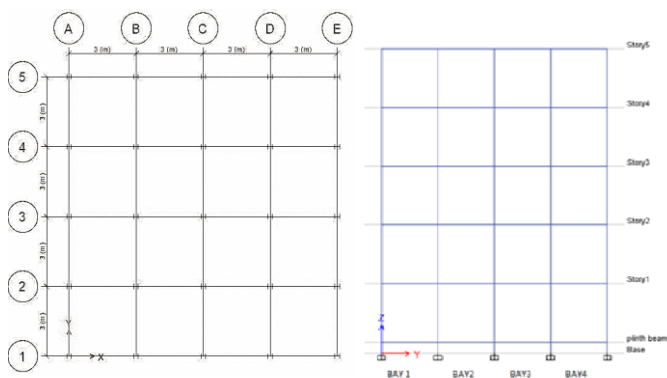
plan of both 5 and 15 story building and elevation of 5 story building
